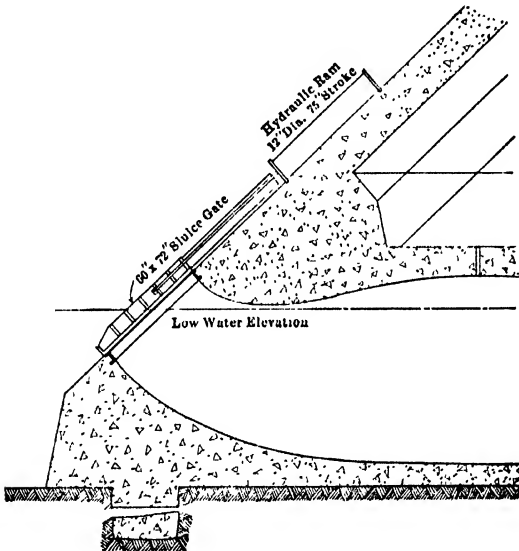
Section through sluice way showing cylinder and sluice gate, mounted on face of hollow dam.
